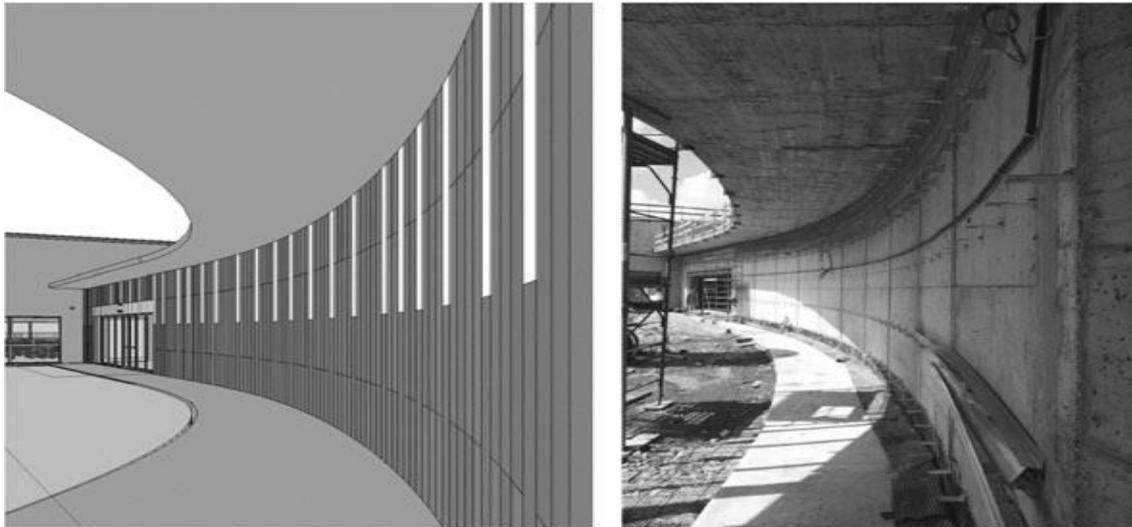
BIM model façade and onsite façade. (Di Giuda *et al.* 2020: 170)
